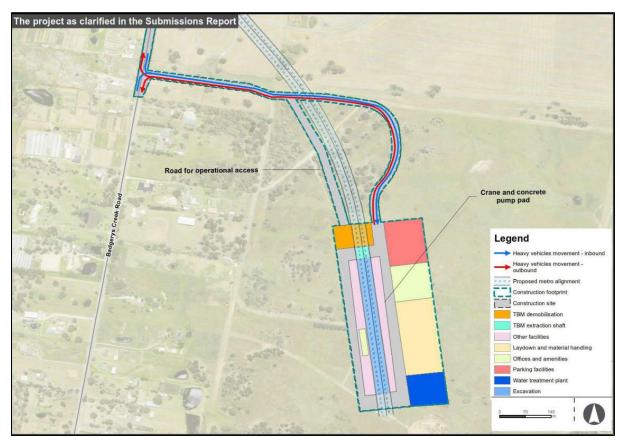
Aerotropolis Core indicative construction site layout –approved project (SMWSA Submissions Report, 2021)
